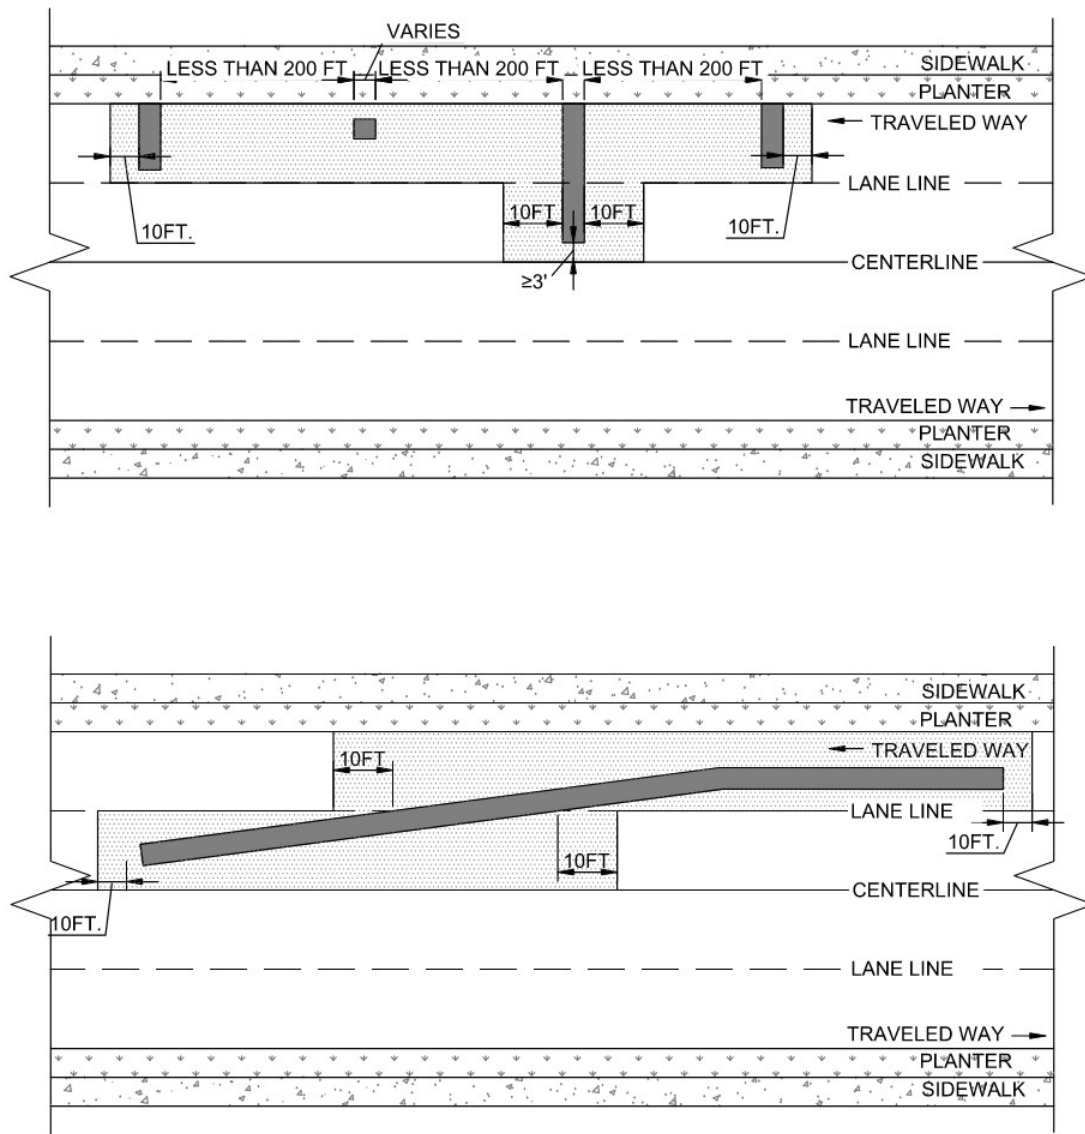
4 Overlay Limits for Pavement Cuts that Cross from One-Lane to Another
